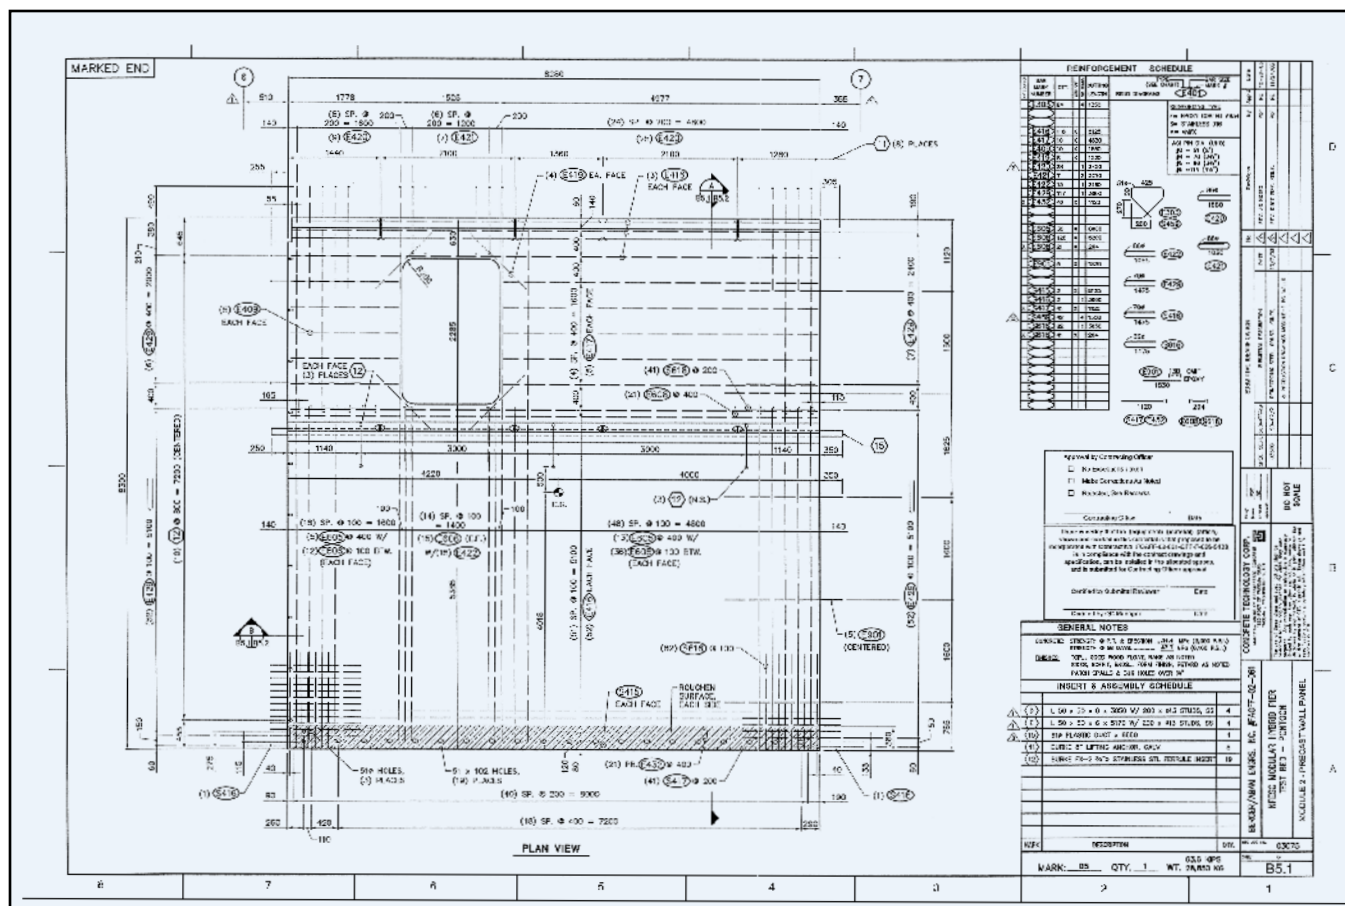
Plan view of Module 2 precast concrete wall panel.
